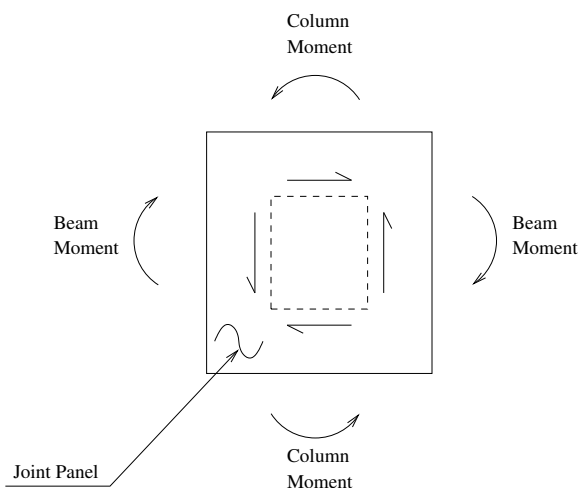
Panel Zone Shear Caused by Beam and Column Moments at the Joint
